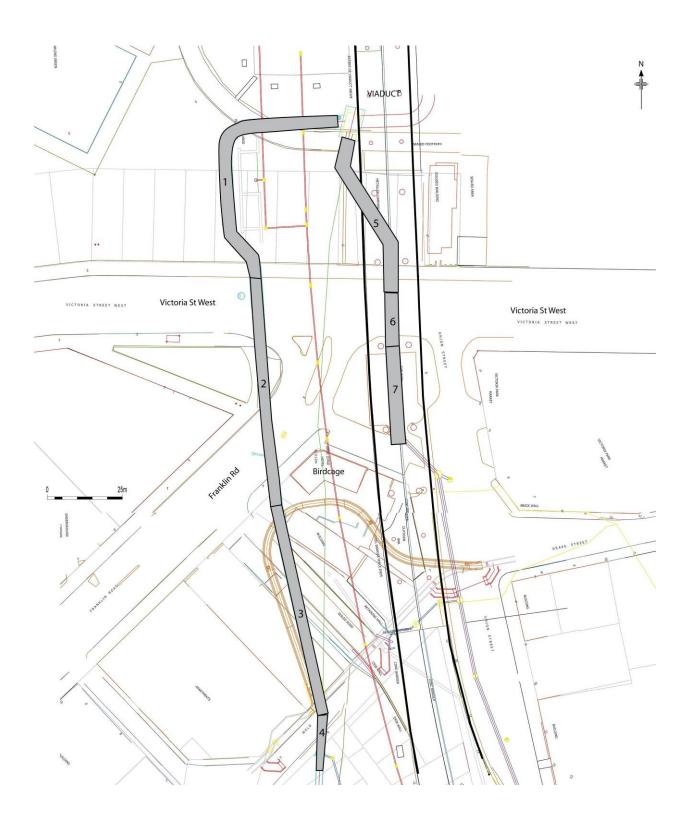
Areas 1-7 of the Stormwater Diversion trenches
